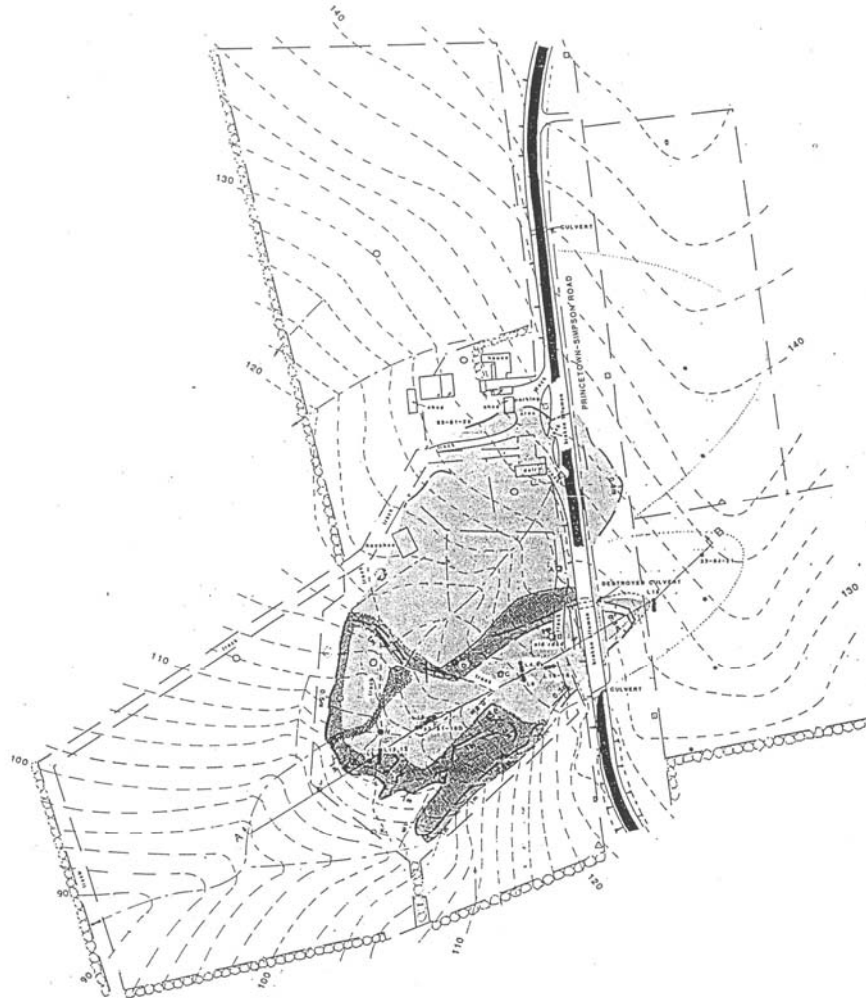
Survey plan of Bouwman's Landslide carried out in 1982 (Cooney, 1983)
